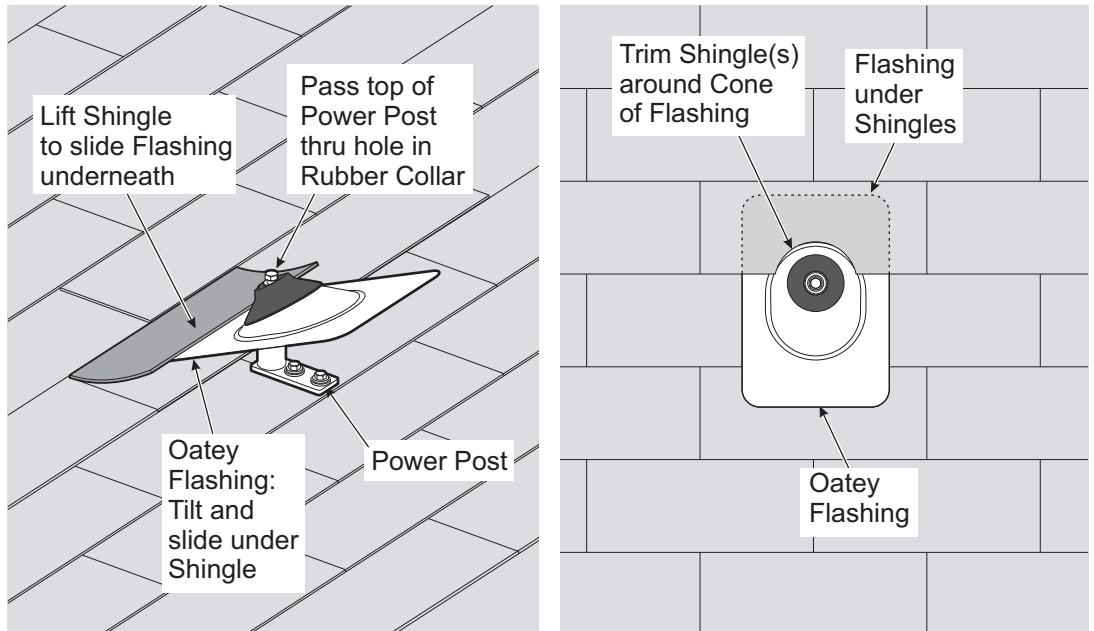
Sliding Oatey Flashing underneath Shingles and Trimming Shingles
